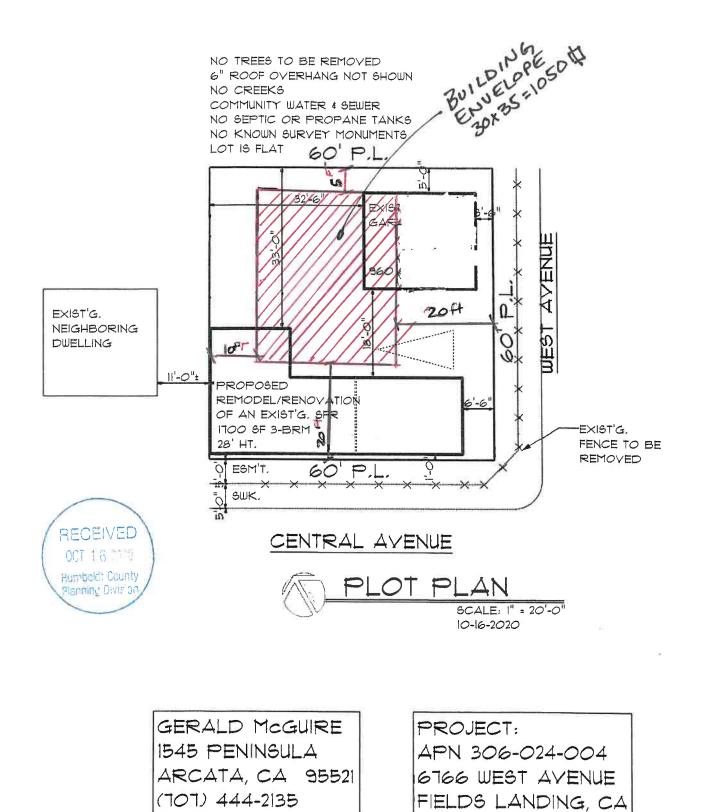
EXHIBIT B BUILDING ENVELOPE WITH RELAXED SETBACK
